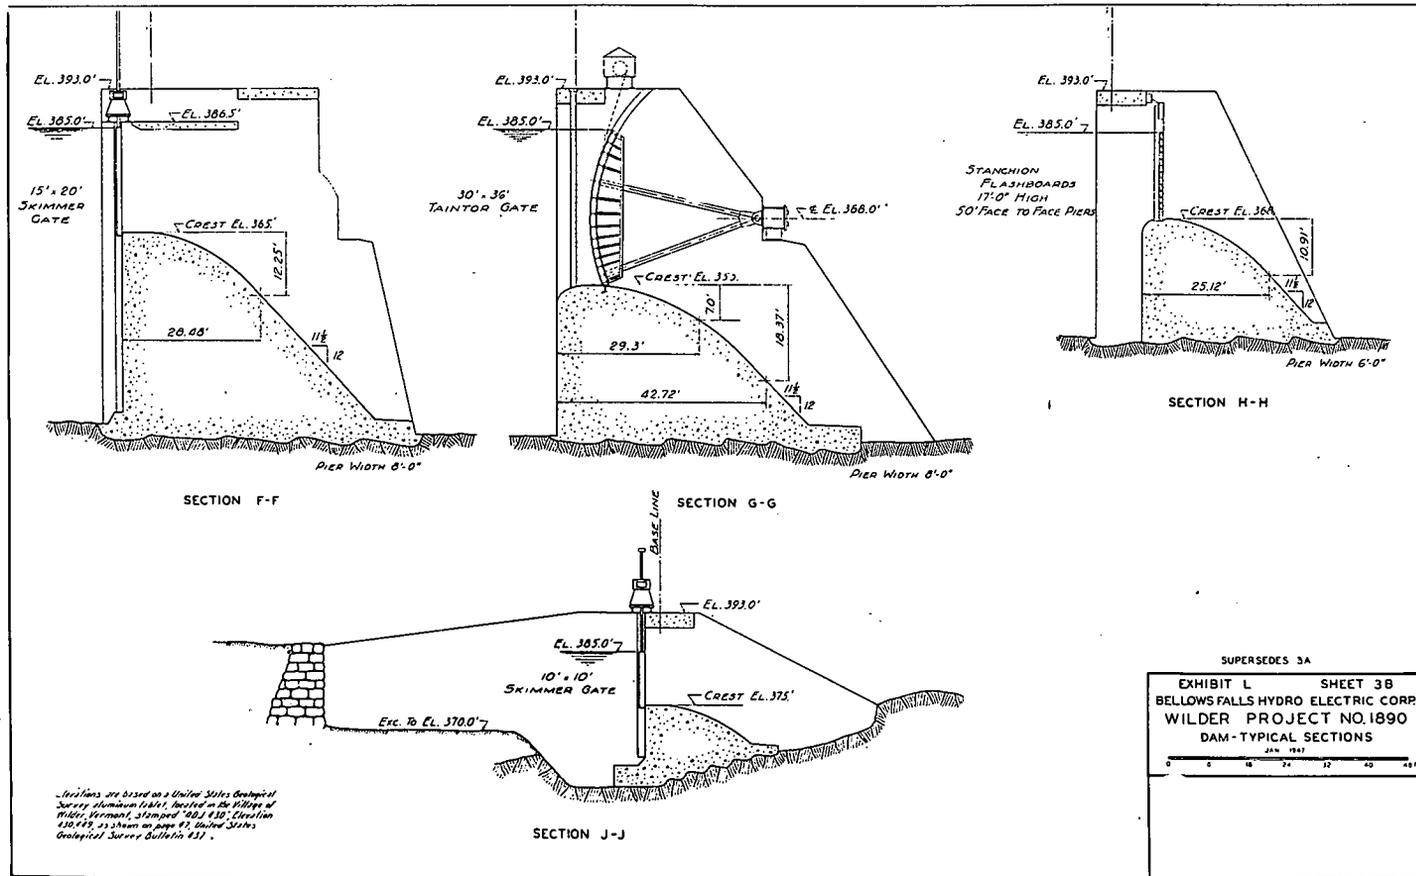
CROSS SECTIONS, SPILLWAY DAM AND GATES.
